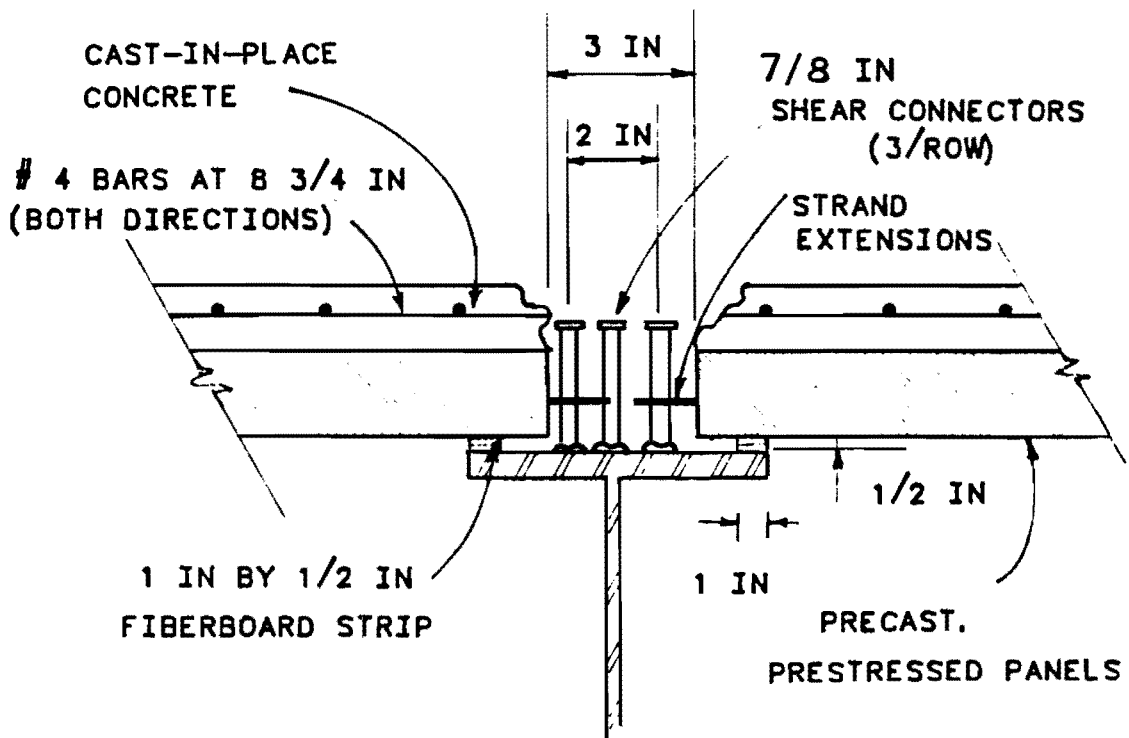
(b) Details of connection between girders deck with precast, prestressed panels
